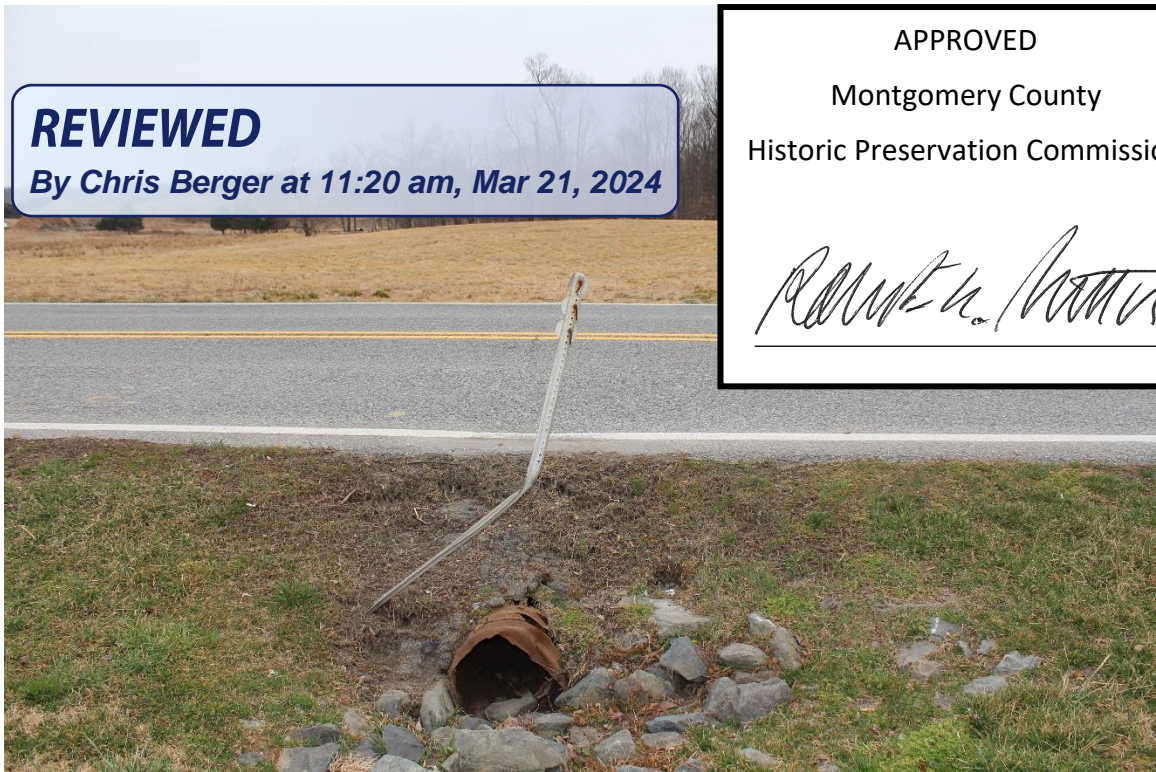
Existing culvert south of driveway, looking southwest to the Red Door Store Property (RK&K, March 2021)
